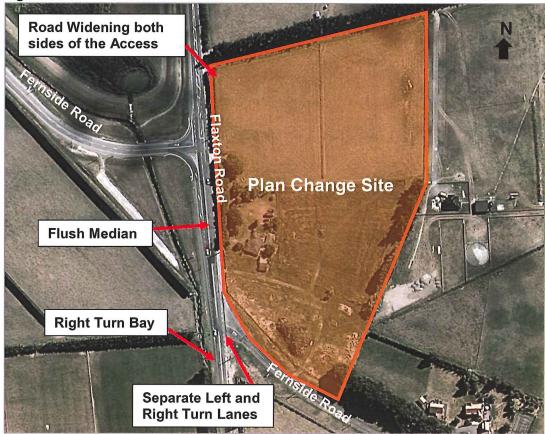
Recommended Alterations to Flaxton Road and Fernside Road
